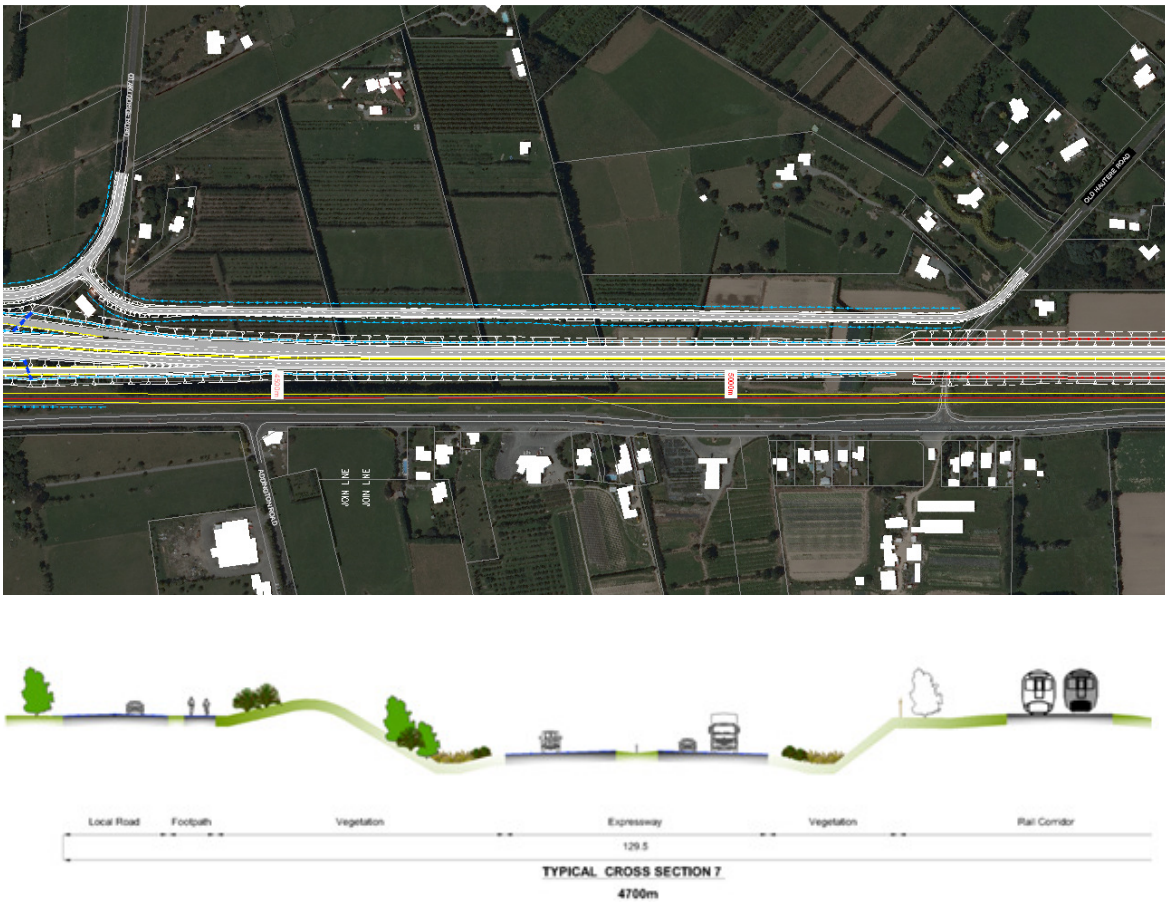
Old Hautere Road Preferred Scheme (plan and section)
